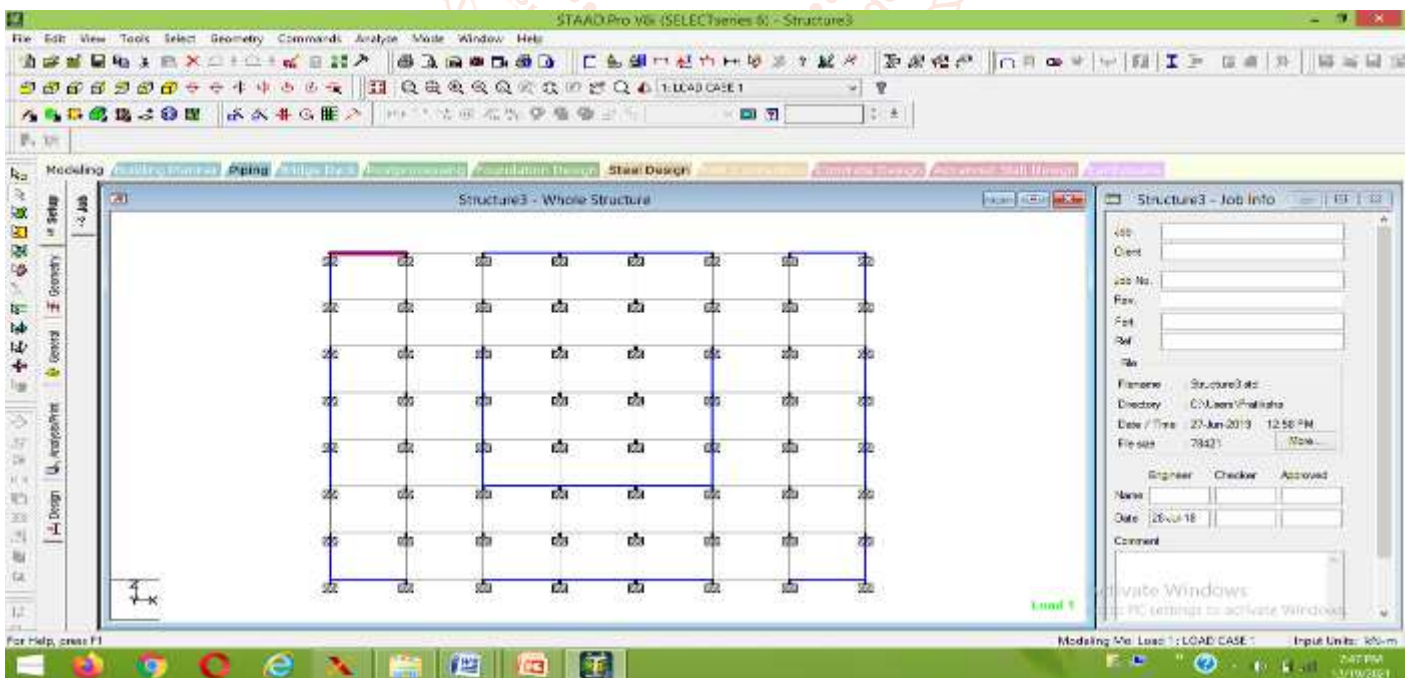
Building frame on sloping ground with shear wall For Loading
